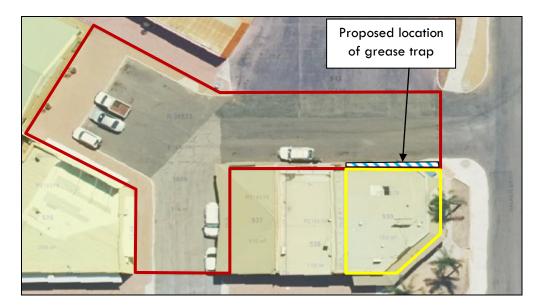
Site plan showing Reserve 38533 in red and Lot 539 in yellow.
